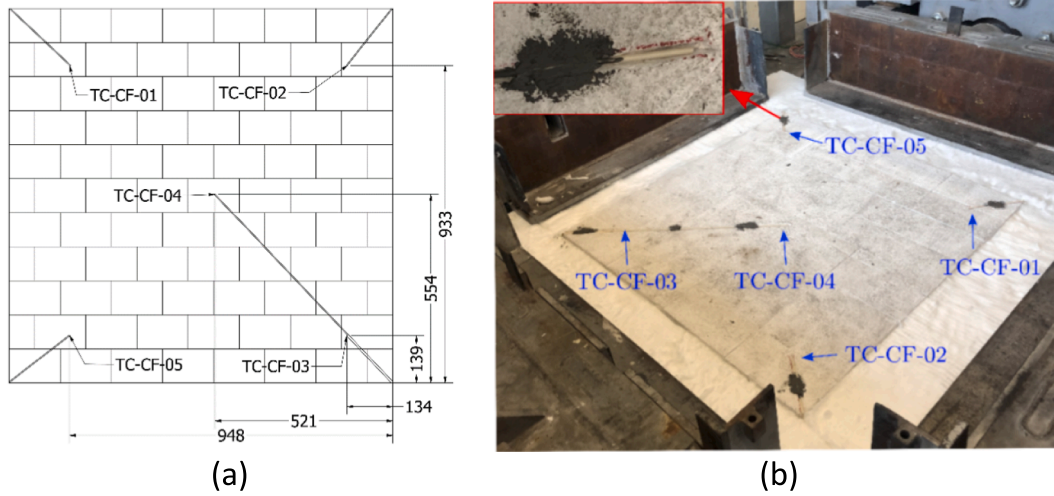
Location of thermocouples for the cold face: a) schematic plan view, all dimensions are in mm; b) thermocouples in place.
